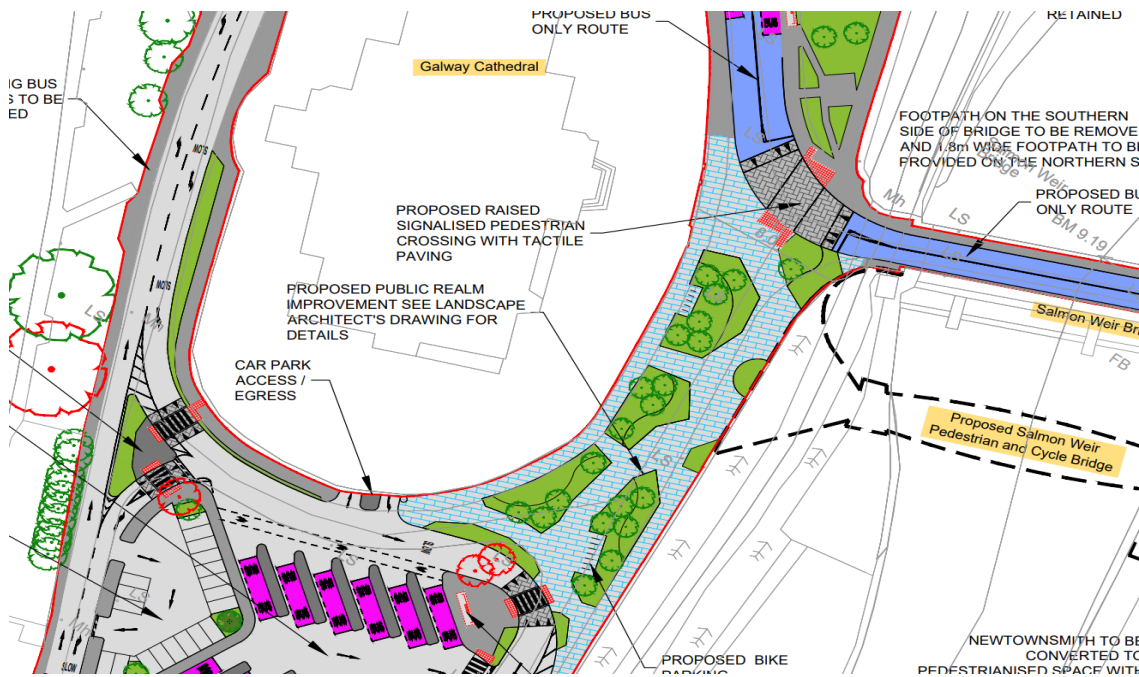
General Arrangement of Proposed Scheme at Galway Cathedral
